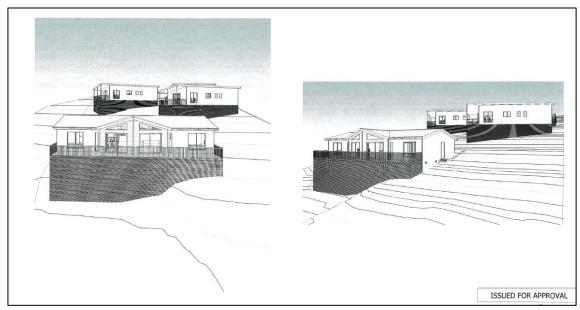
Visual Concept Plan of Proposed Visitor Accommodation Units (source: TasBuilt Homes 2019)
